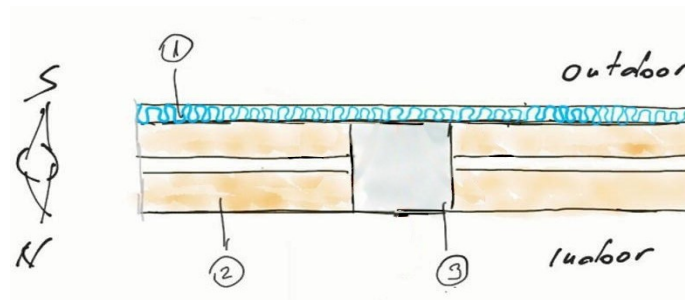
Conceptual drawing of a typical constructive design of opaque façades of 1971-1990's Portuguese residential buildings retrofitted with ETICS: 1 – ETICS; 2 – Masonry wall; 3 – Concrete column.
